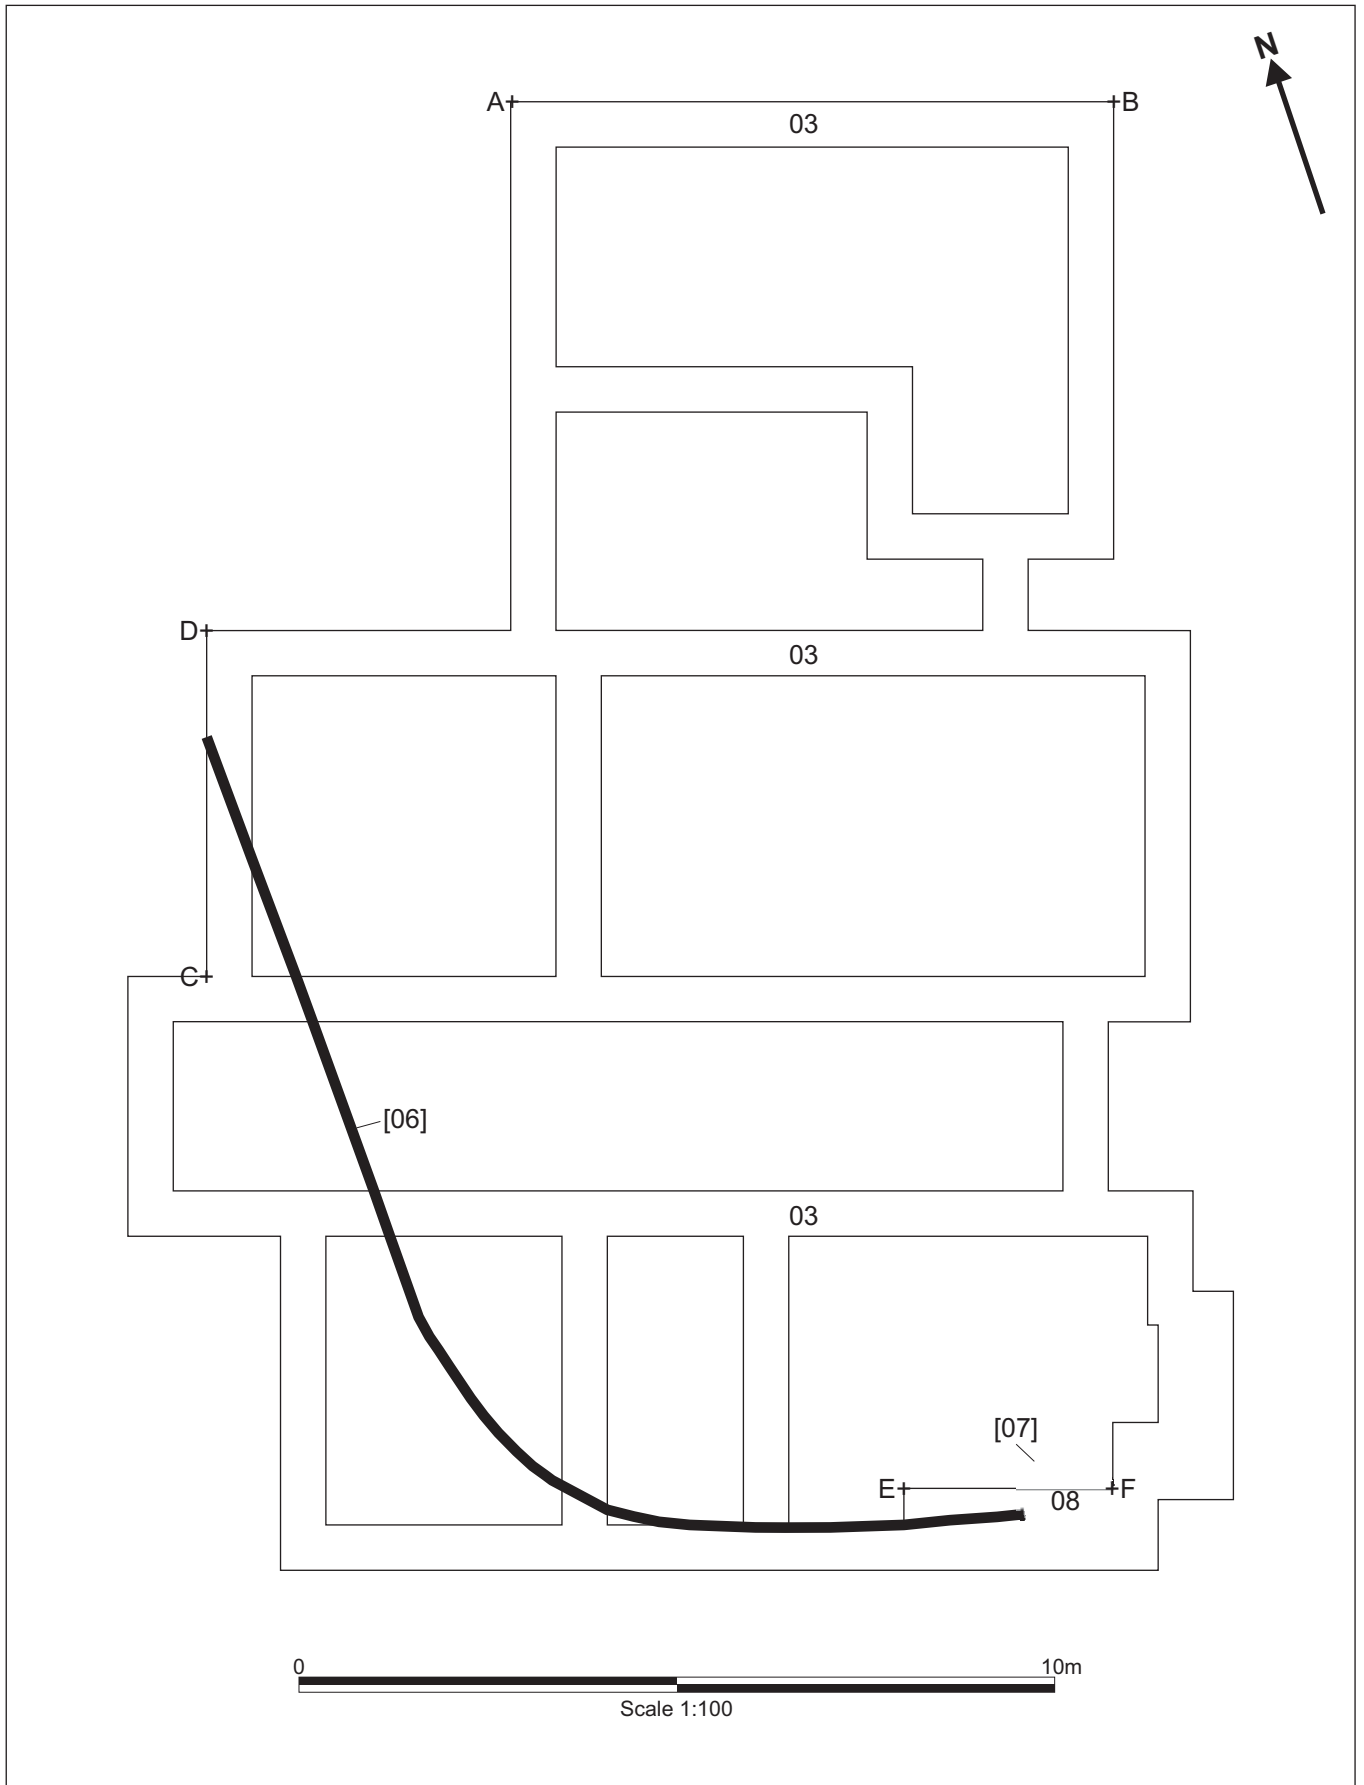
Plan of the foundation trenches at scale 1:100. Sections A-B, C-D and E-F located on Figure 4
